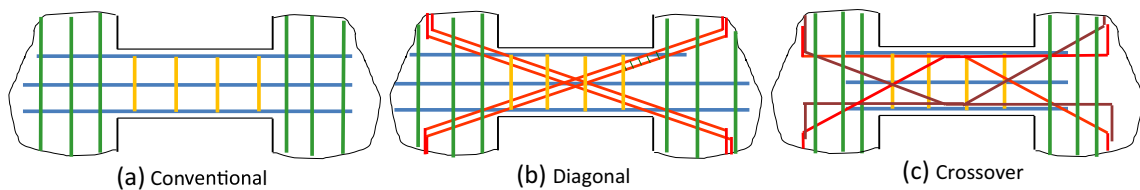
Several arrangement examples of reinforcements in RC coupling beams.
